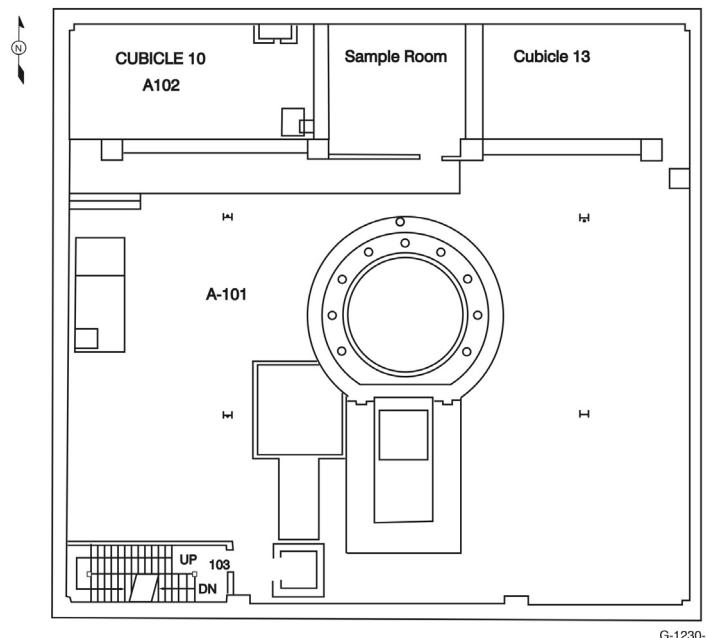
Power Burst Facility reactor building (PER-620) first basement showing Cubicles 10 and 13.
